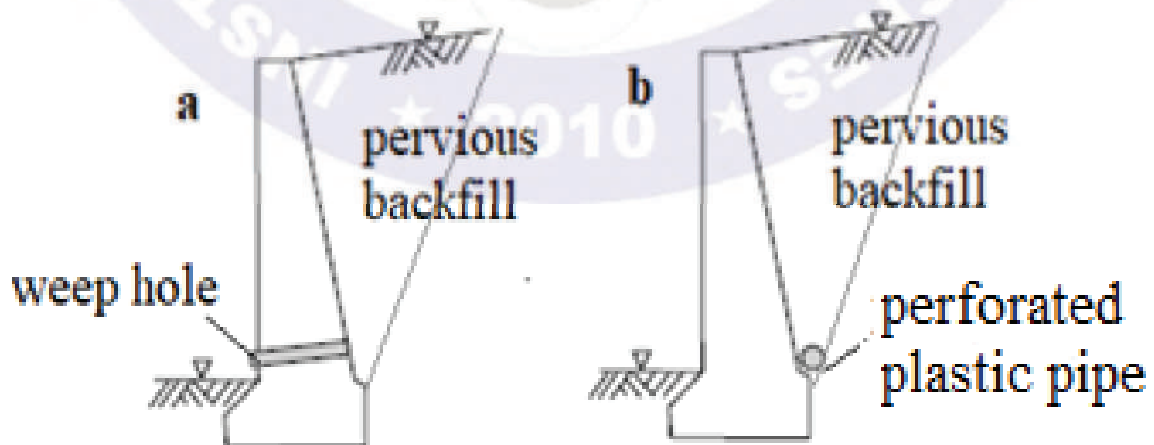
Examples of drainage system of retaining walls (Brooks, 2010)
